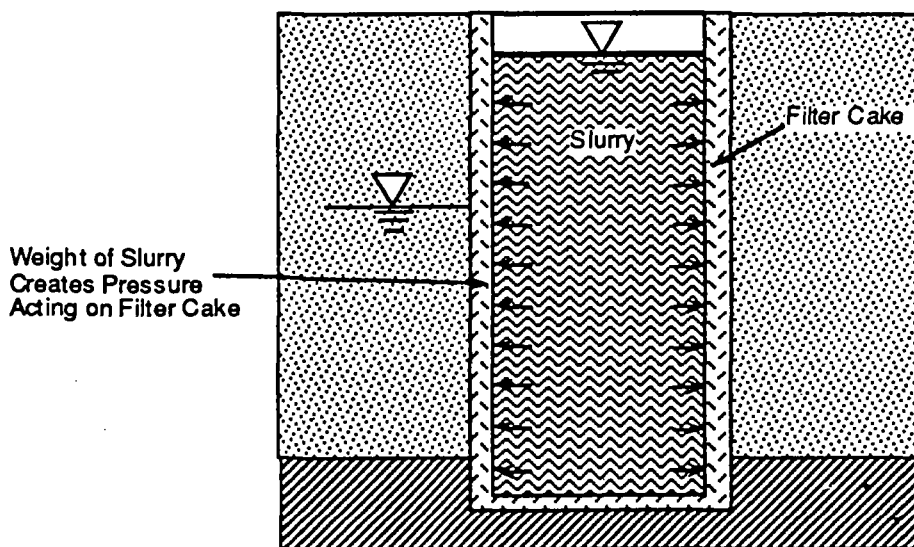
Hydrostatic Pressure from Slurry Maintains Stable Walls of Trench.
